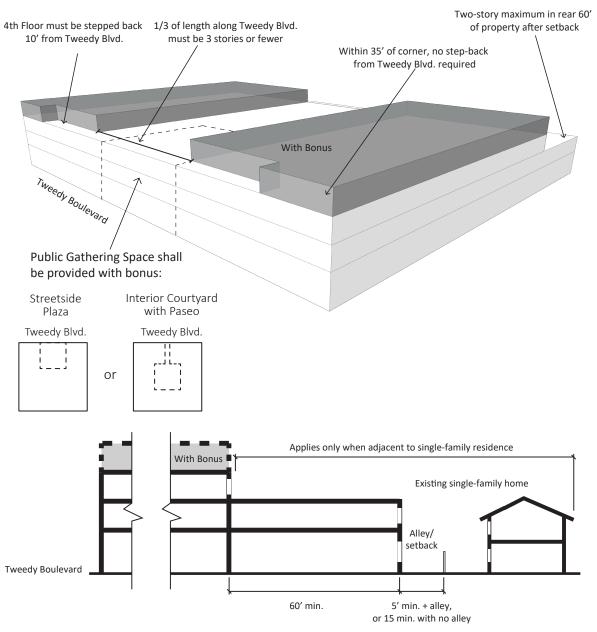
Maximum Building Envelope Sites at Least 200' Deep
